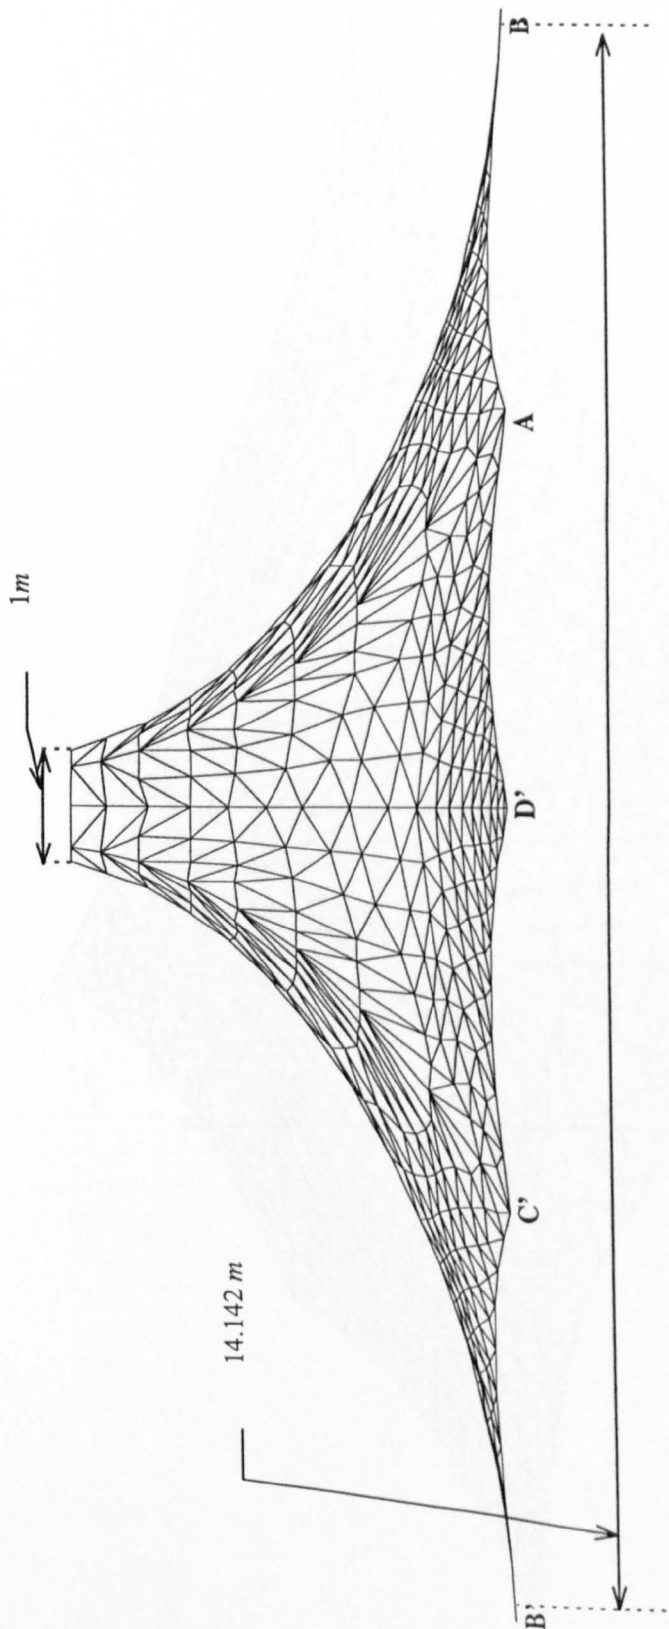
Example 5.2.6 - Side Elevation (Cross-Section BB').
